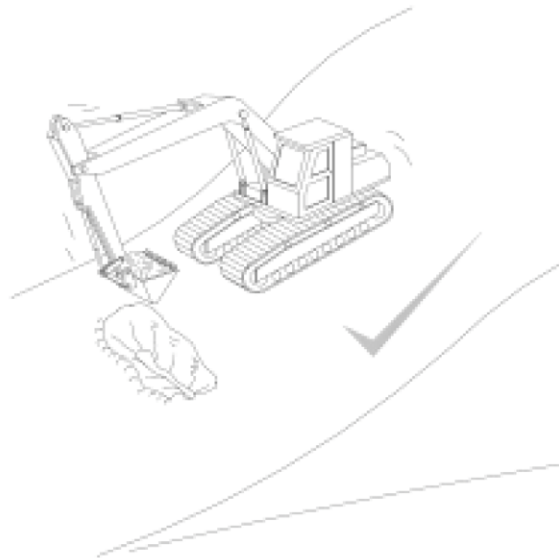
While at work on a slope, the crawlers of the excavator should be placed along the slope
